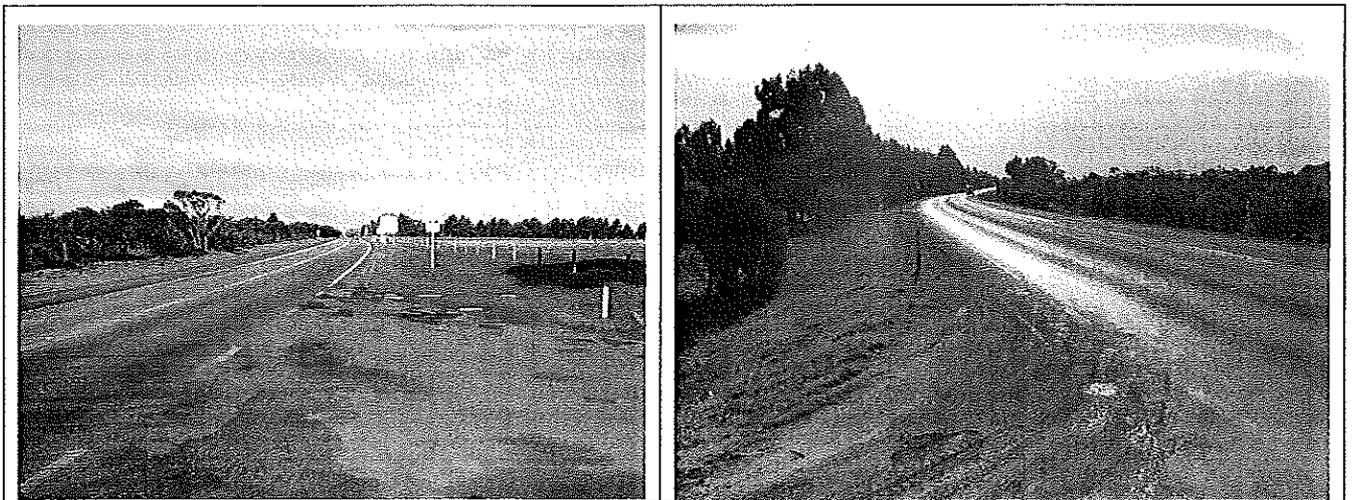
Lines of sight at Gunn Road Albany Highway Intersection
